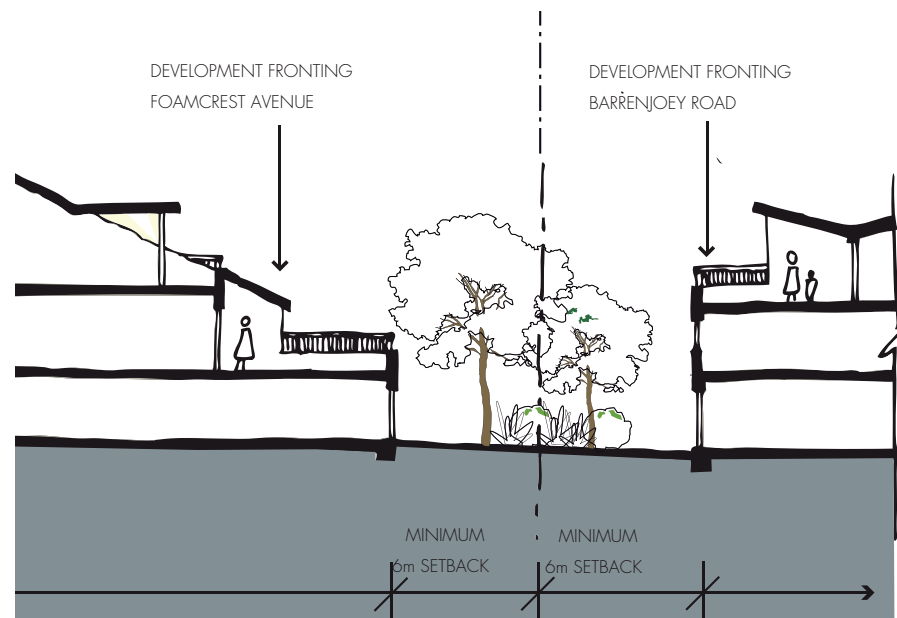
Barrenjoey Road and Foamcrest Avenue: Rear setbacks
